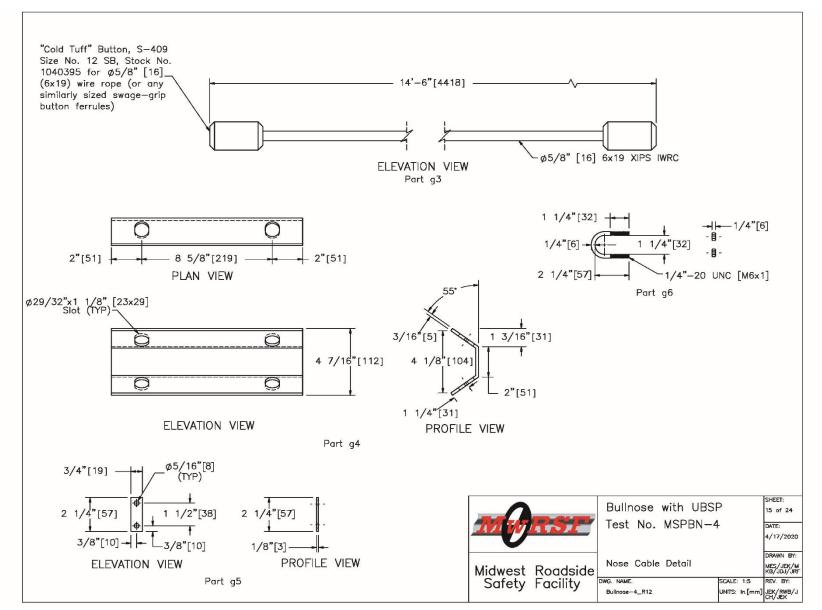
Nose Cable Detail, Test No. MSPBN-4
